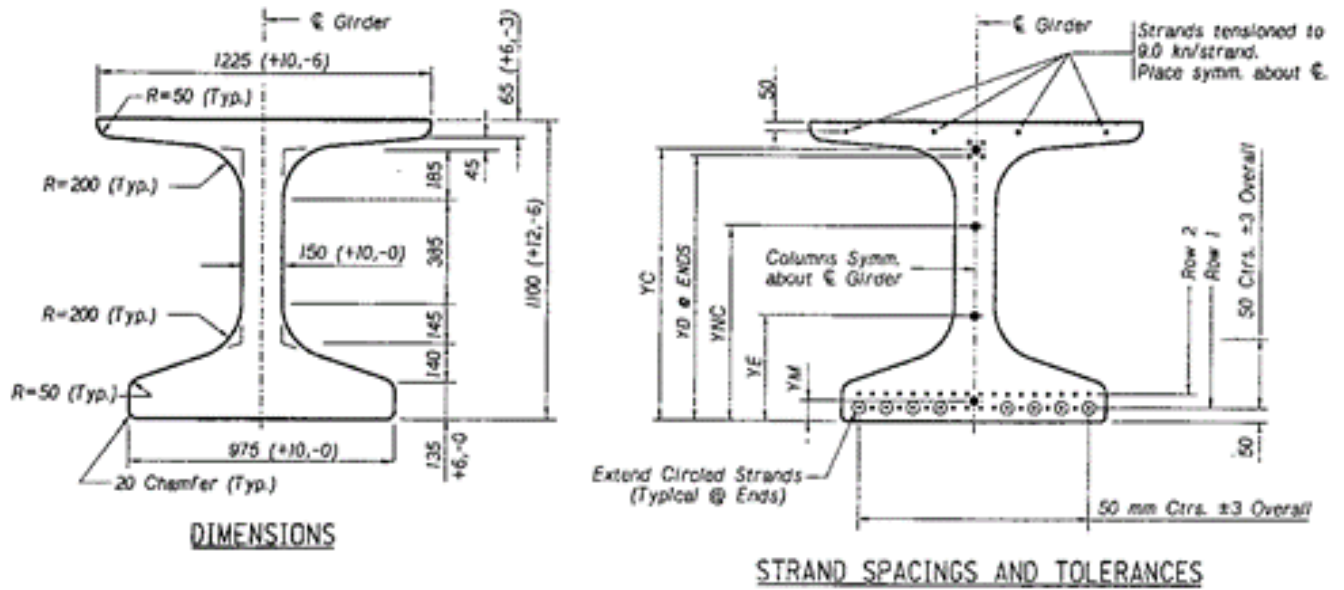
Girder dimensions and strand distribution, from the construction documents of 168th St. over West Dodge Road Bridge, courtesy of NDOT
